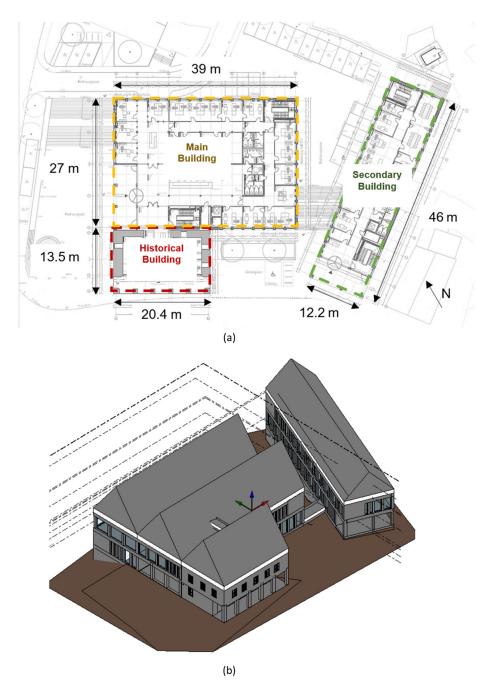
(a) Floor plans of the case study building after [42], (b) Buildings model.
